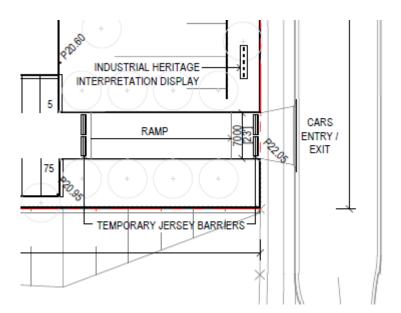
Extract of Architectural Plan illustrating the proposed temporary jersey barriers.
